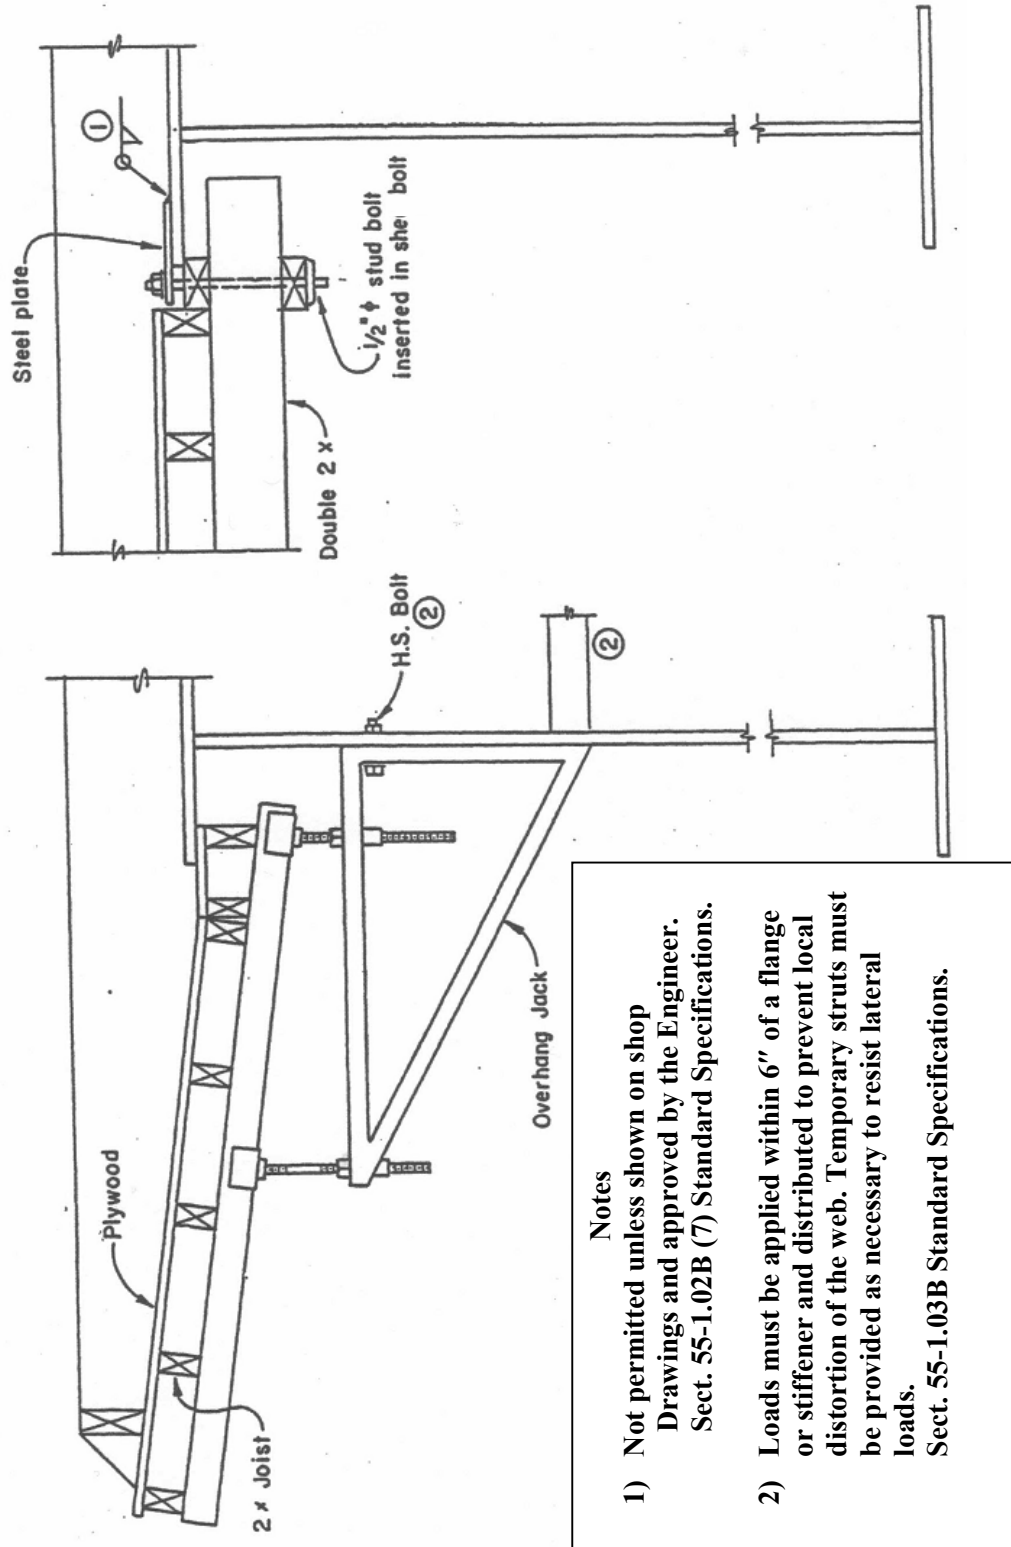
Sample Steel Girder Bridge Falsework Details.
